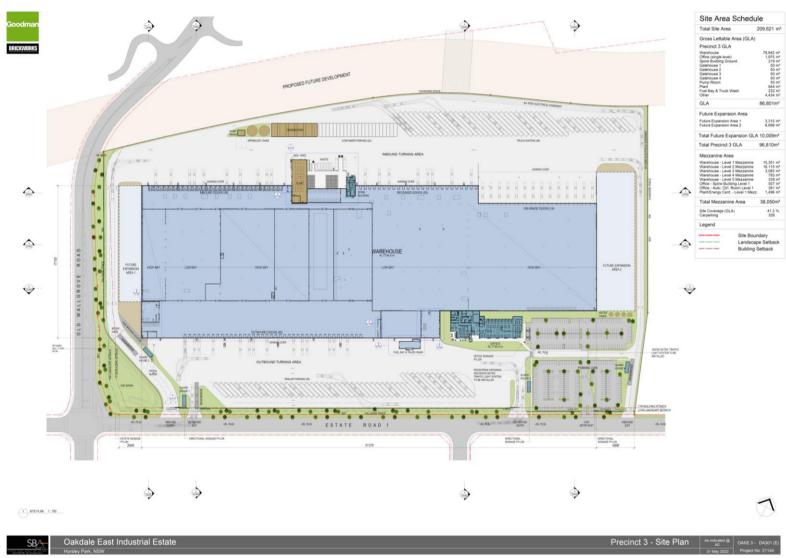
Building 3A Site Plan (Source: SBA Architects)
